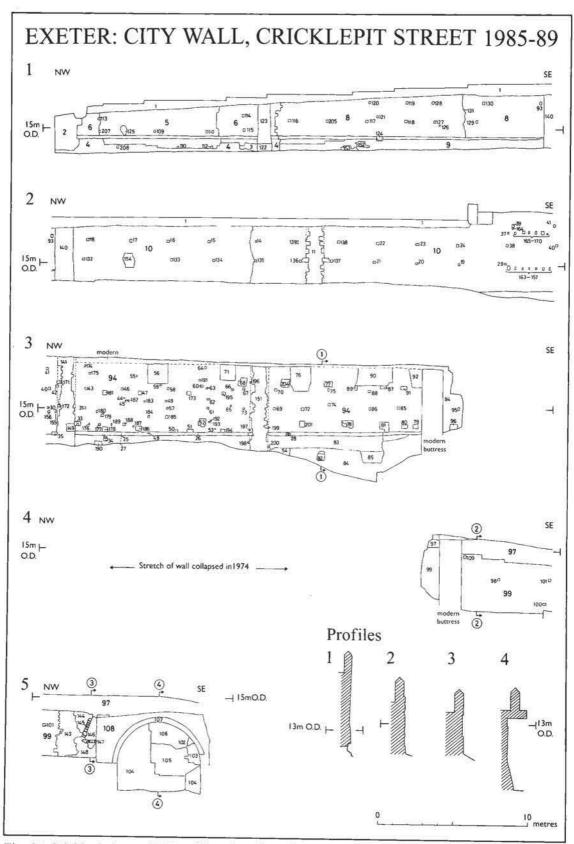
Cricklepit Street 1985, outline elevation of the city wall.
